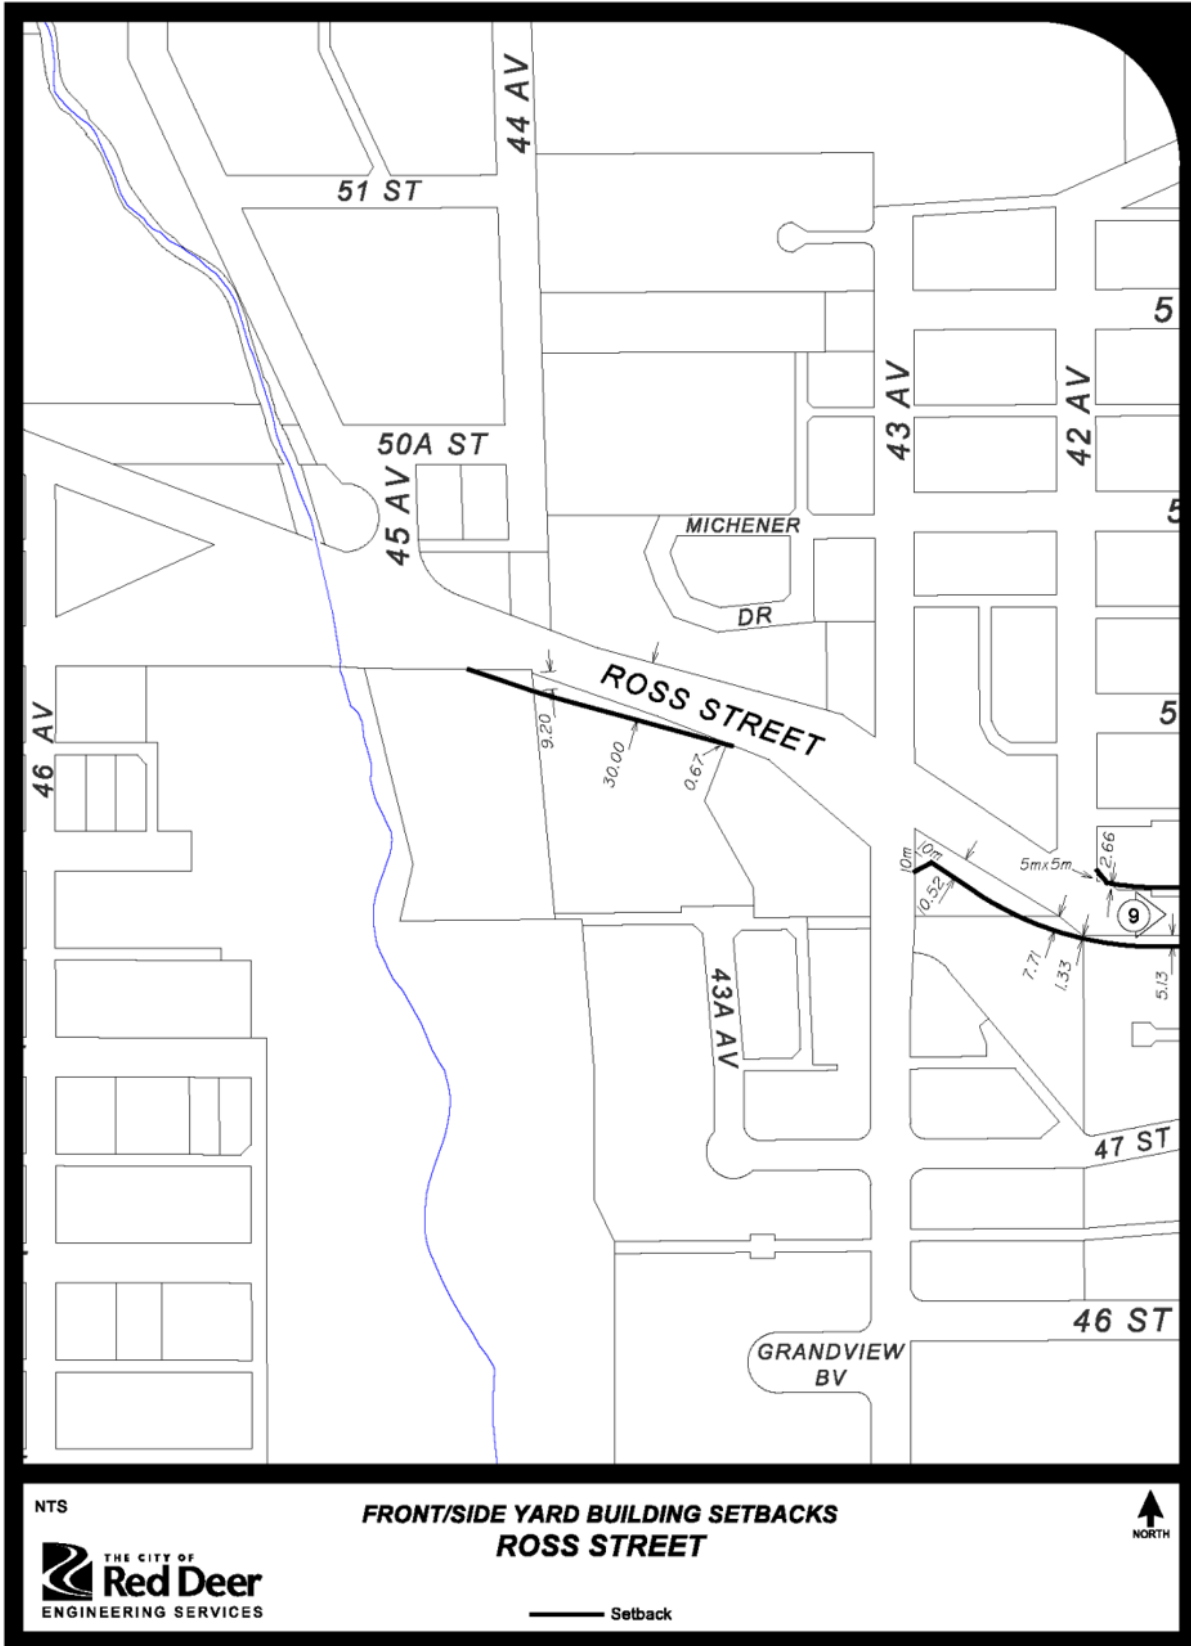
Front and Side Yard Building Setbacks - Ross St (1)
